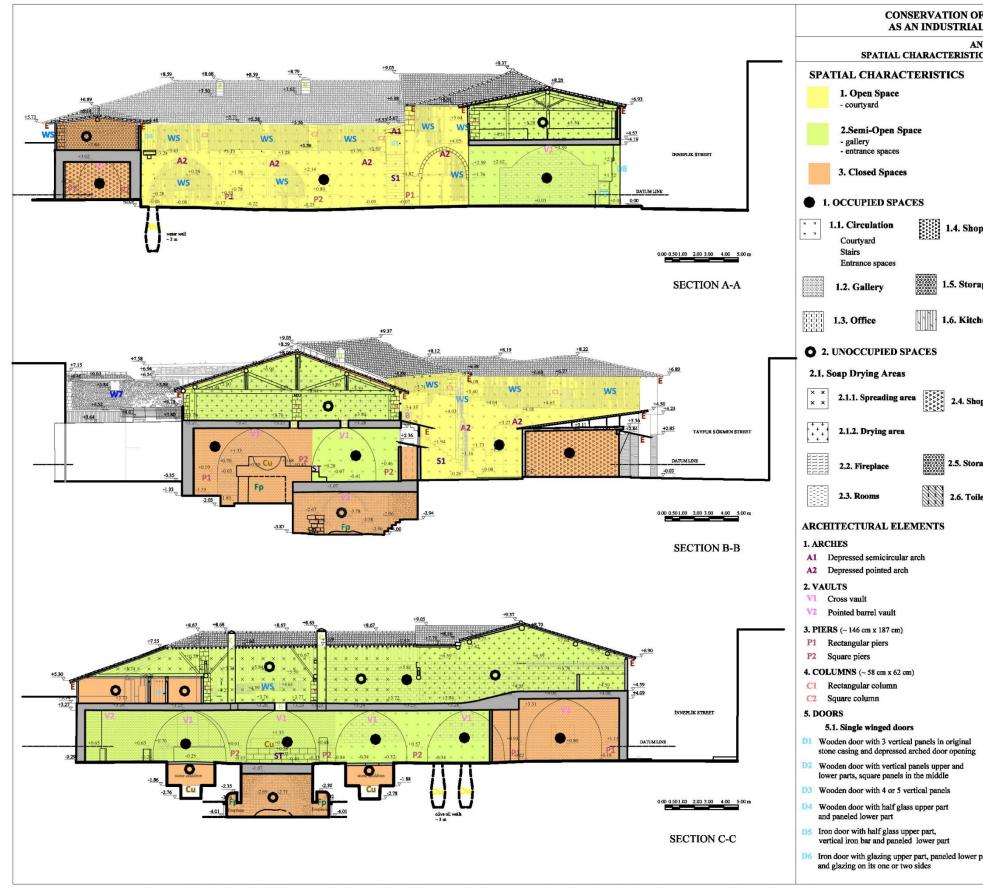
Spatial characteristics and architectural elements – Section A-A, Section B-B and Section C-C
